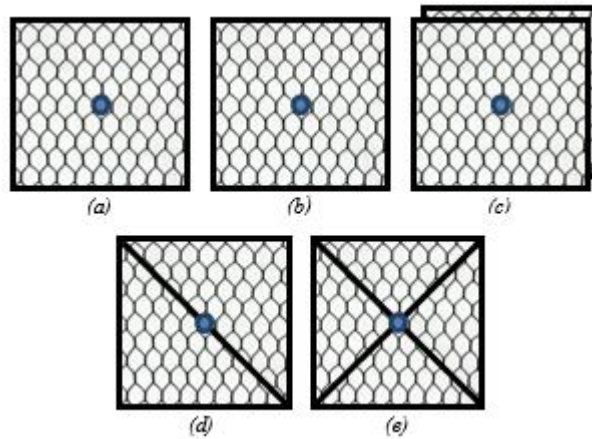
(a) Wire mesh 60x80, (b) Wire mesh 100x120, (c) Double sheet wire mesh, (d) Wire mesh with 1 cable, (e) Wire mesh with 2 cables.
